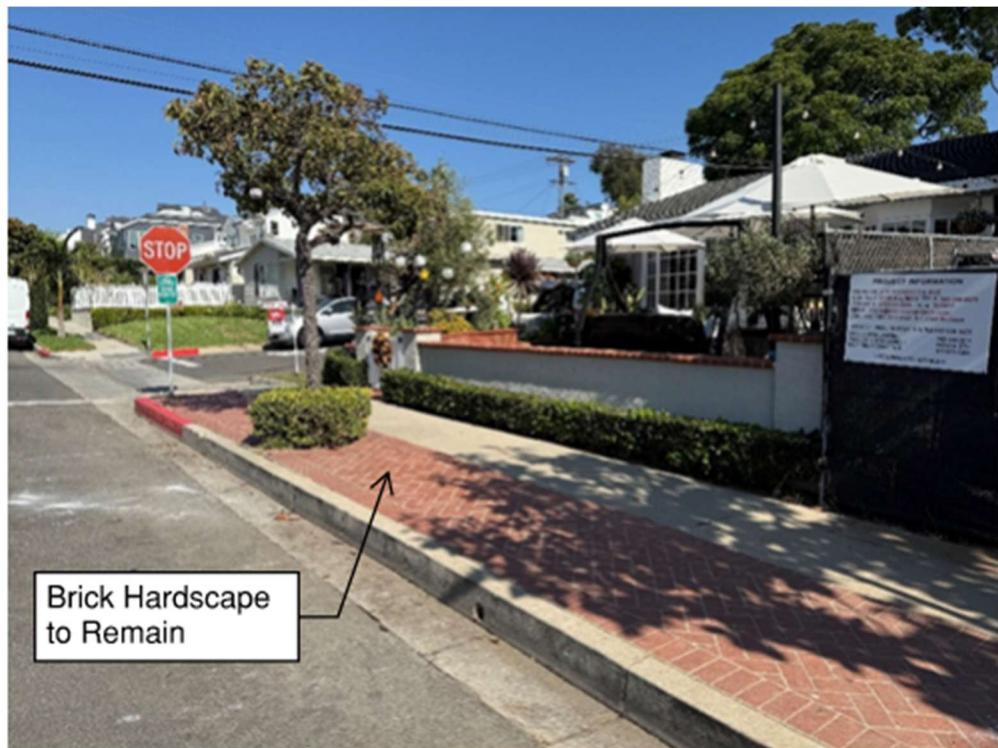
Brick hardscape in the Poinsettia Avenue right-of-way to remain
